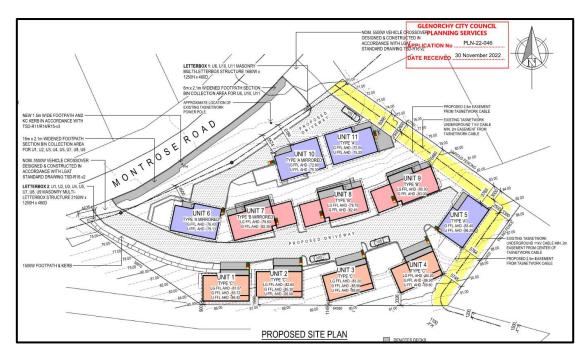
Site plan of proposal at 97 Montrose Road, Montrose.
